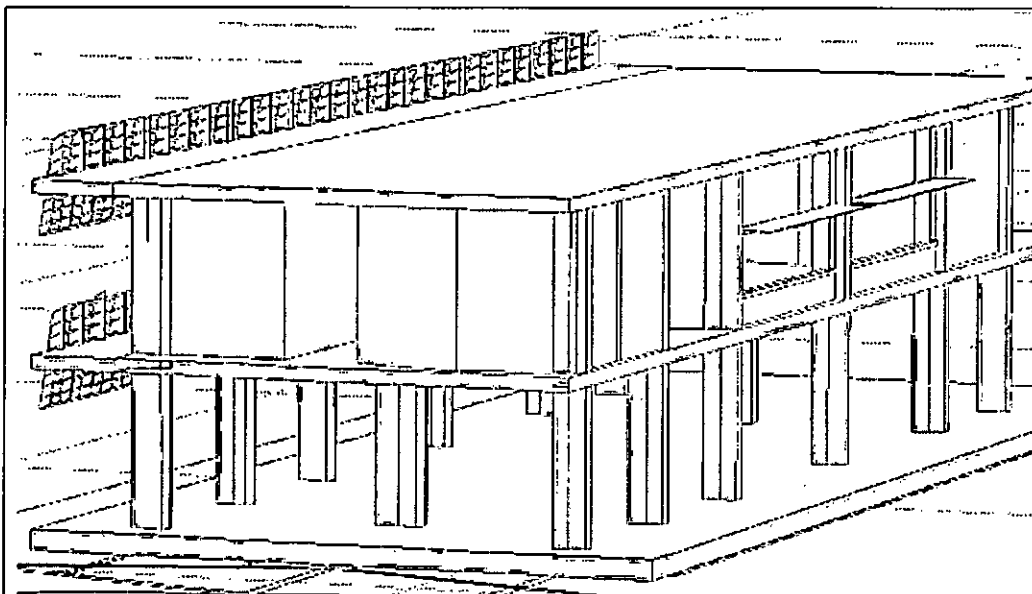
(a): Case 17: light shelf at 2m (south opening)
